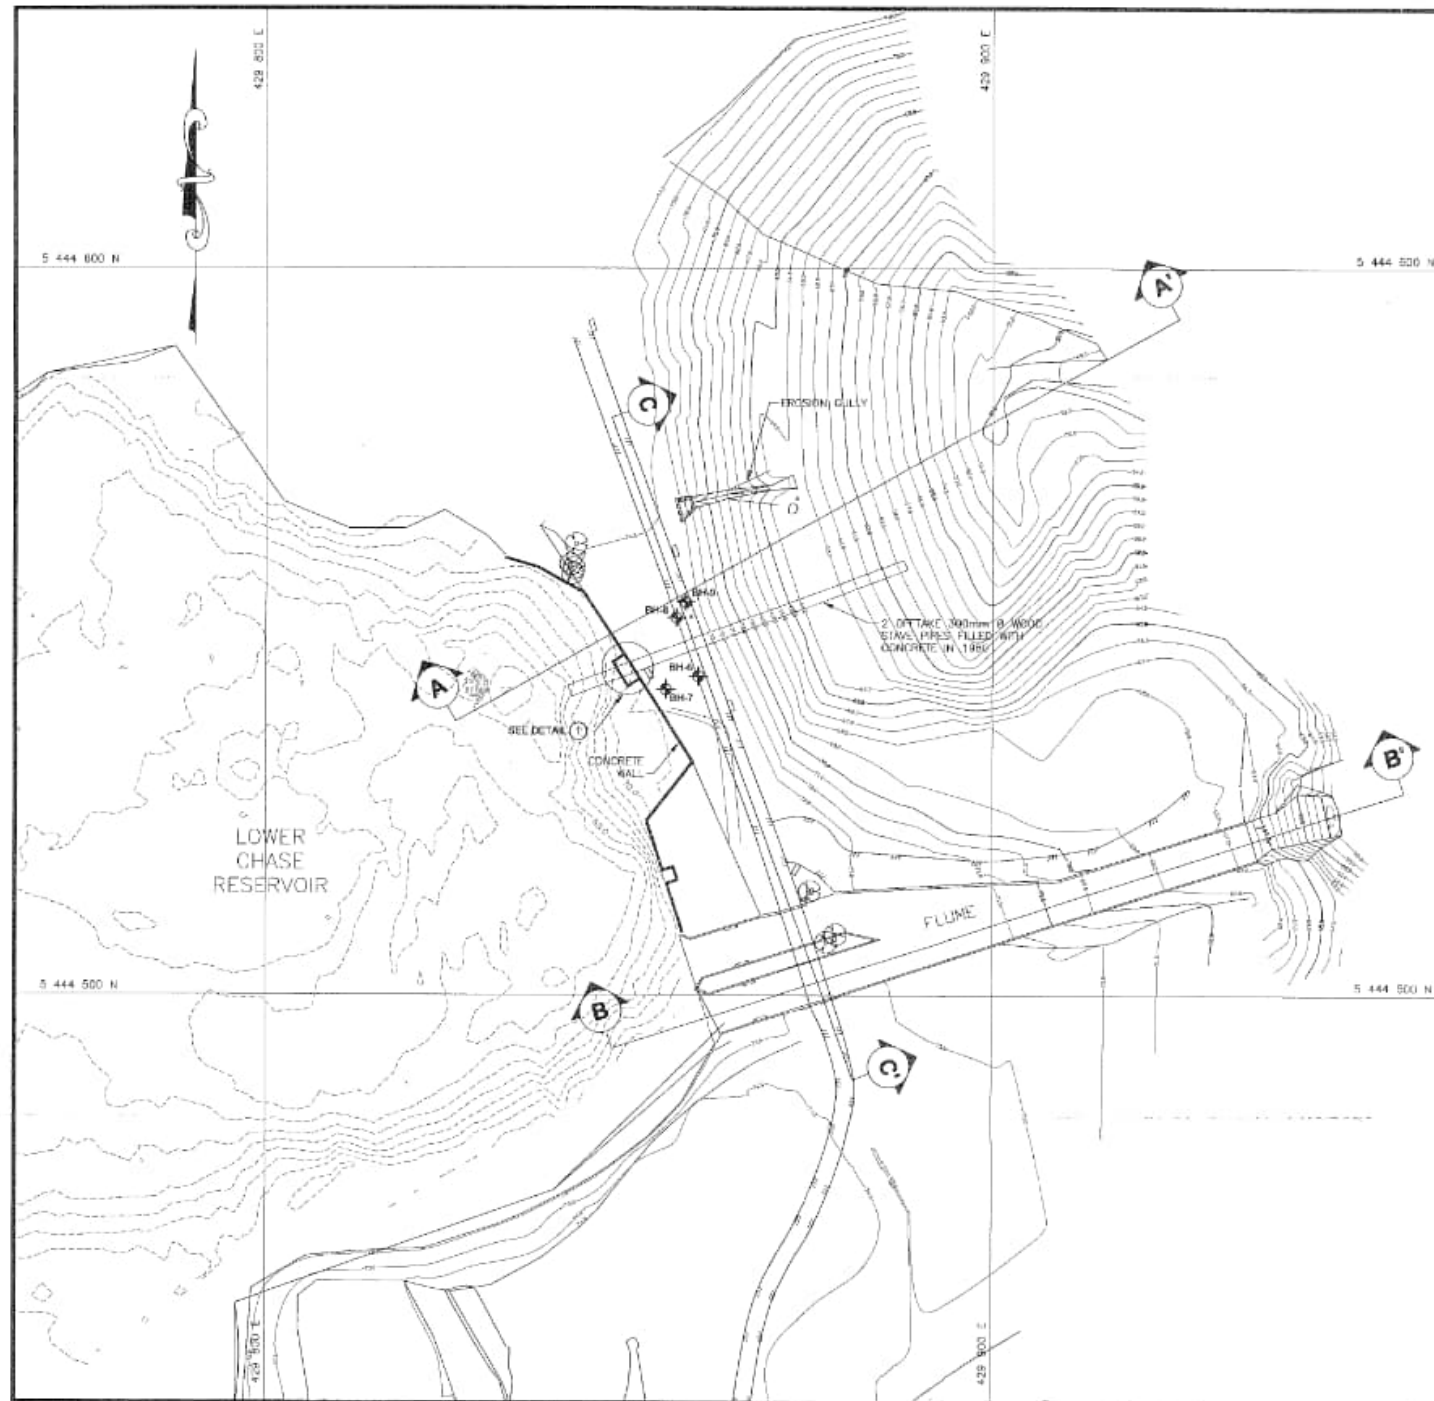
Plan and Cross Sections of Lower Chase River Dam
